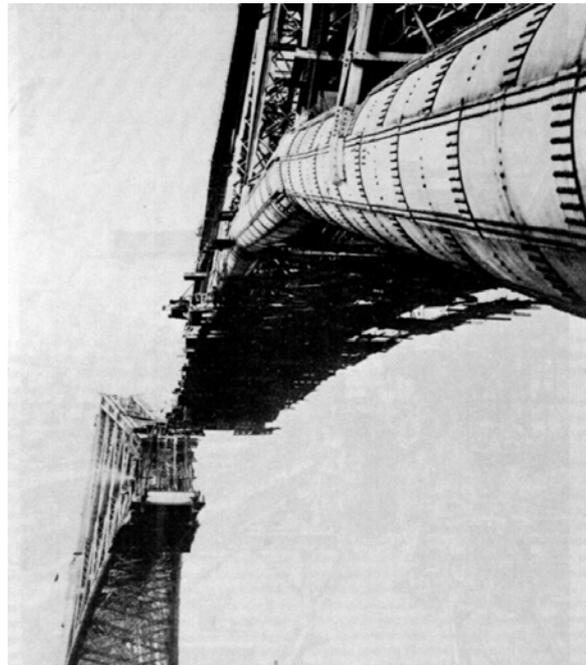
Firth of Forth Bridge, long-span cantilever, 366 cm (12 ft) diameter struts with circular section, Fowler and Baker, 1890. (Fachtmann)
